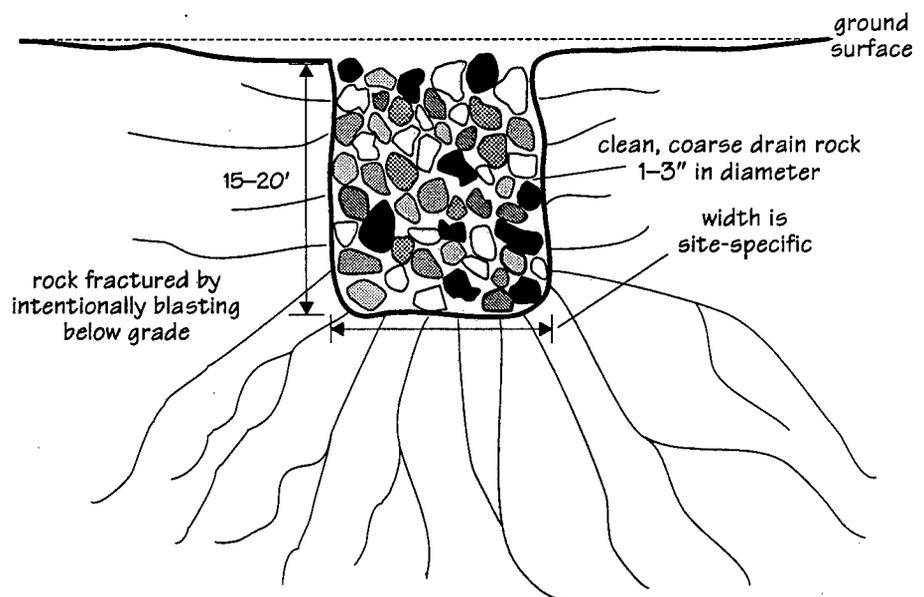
Details of infiltration gallery construction. (See also Fig. 2.9.)
